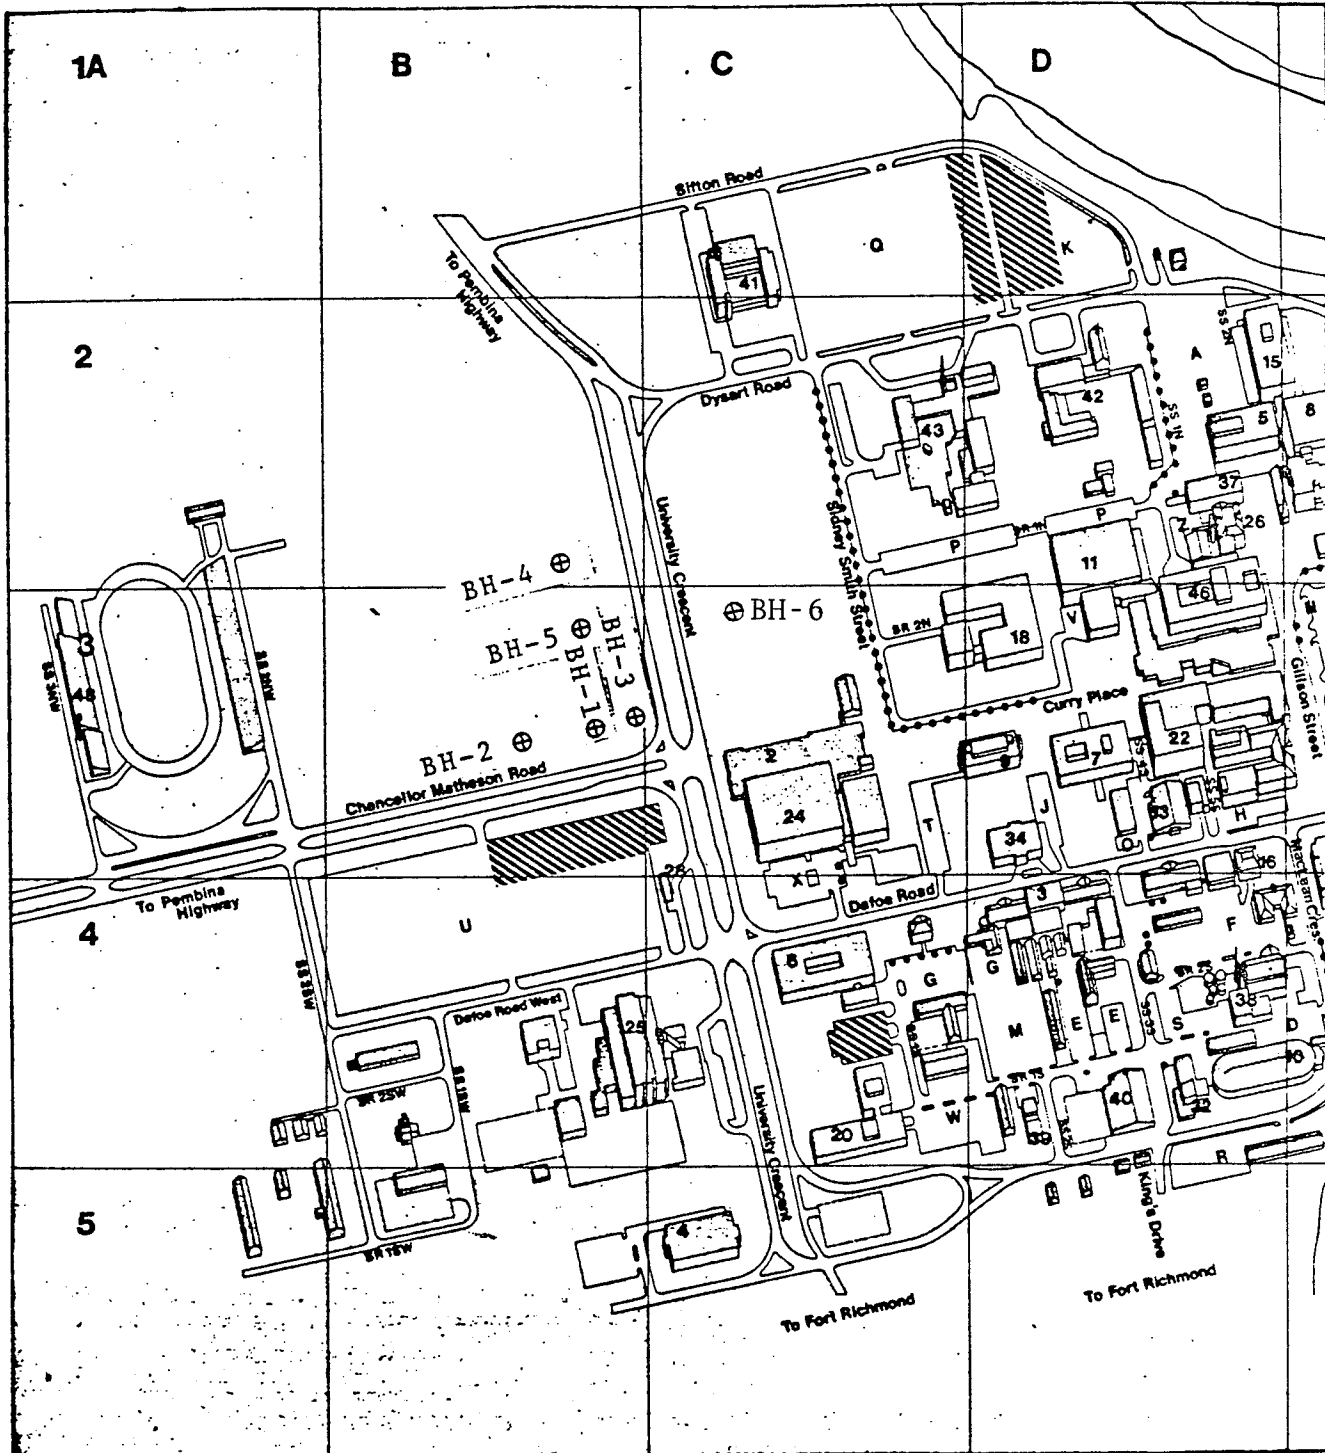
SITE PLAN AND LOCATION OF BOREHOLES 6
